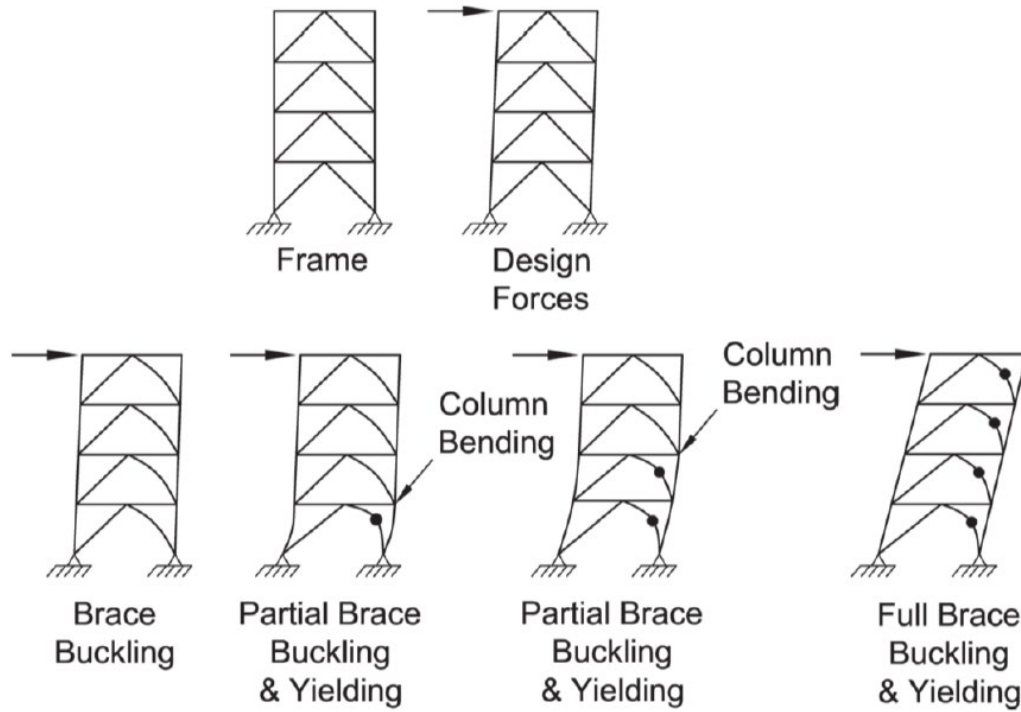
Progressive brace buckling and yielding in MT-SCBFs (American Institute of Steel Construction, 2016a)
